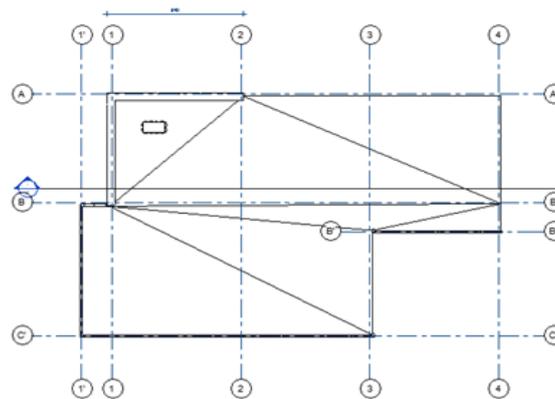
Roof Floor Plan (the location of water storage tank)
